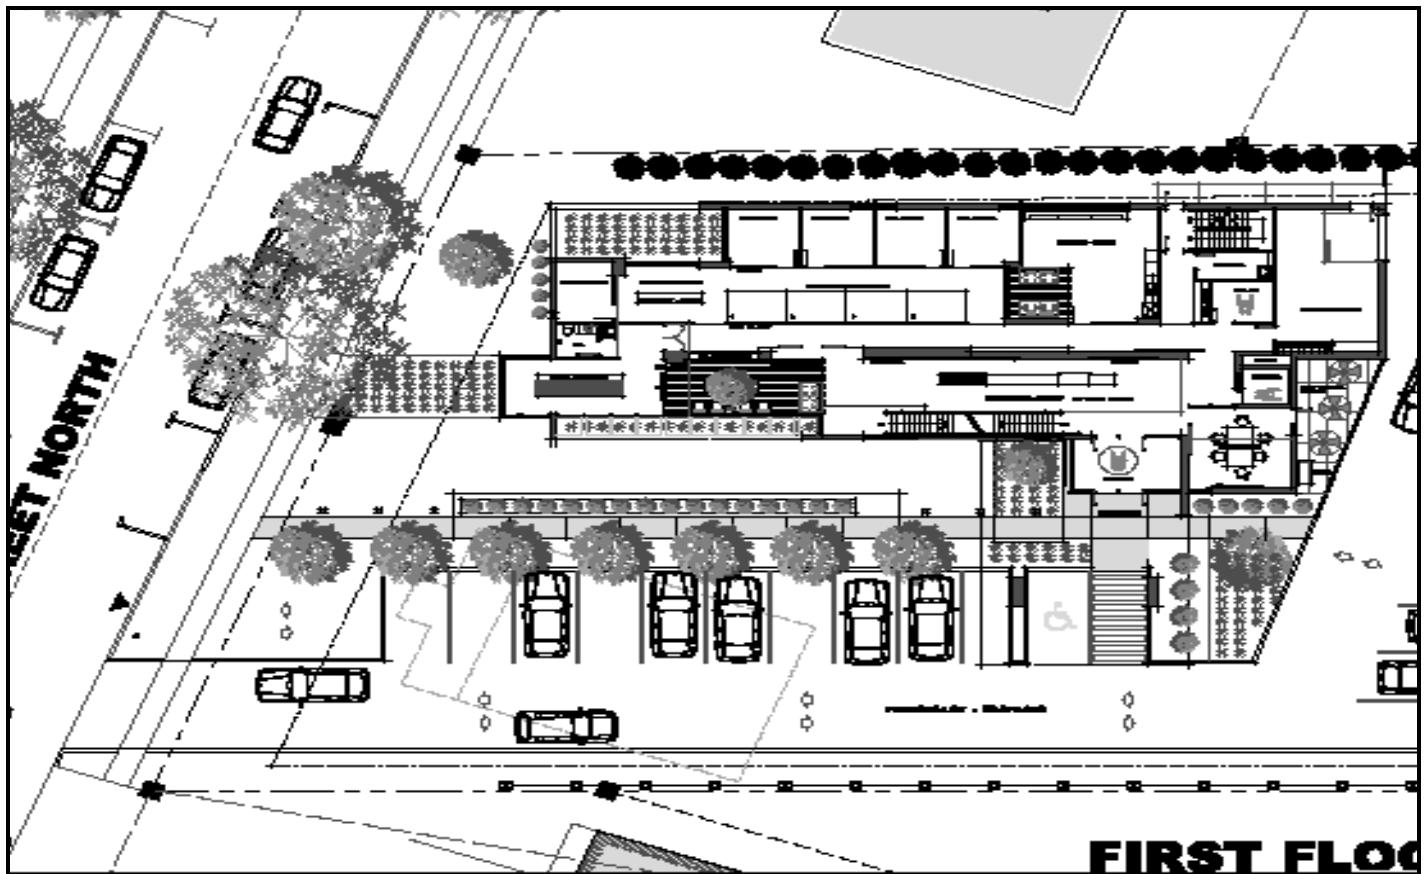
AERIAL PLAN: 45-49 DIVISION STREET N
